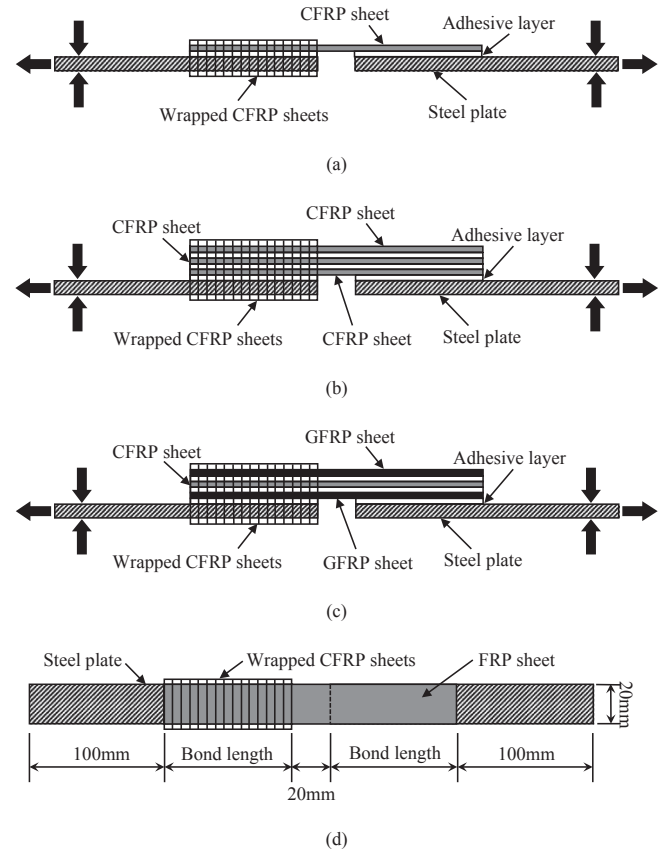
Schematic view of FRP-to-steel single-lap joints: (a) lateral view of the one-layered CFRP-to-steel joint; (b) lateral view of the three-layered CFRP-to-steel joint; (c) lateral view of the three-layered hybrid FRP-to-steel joint; and (d) front view.
